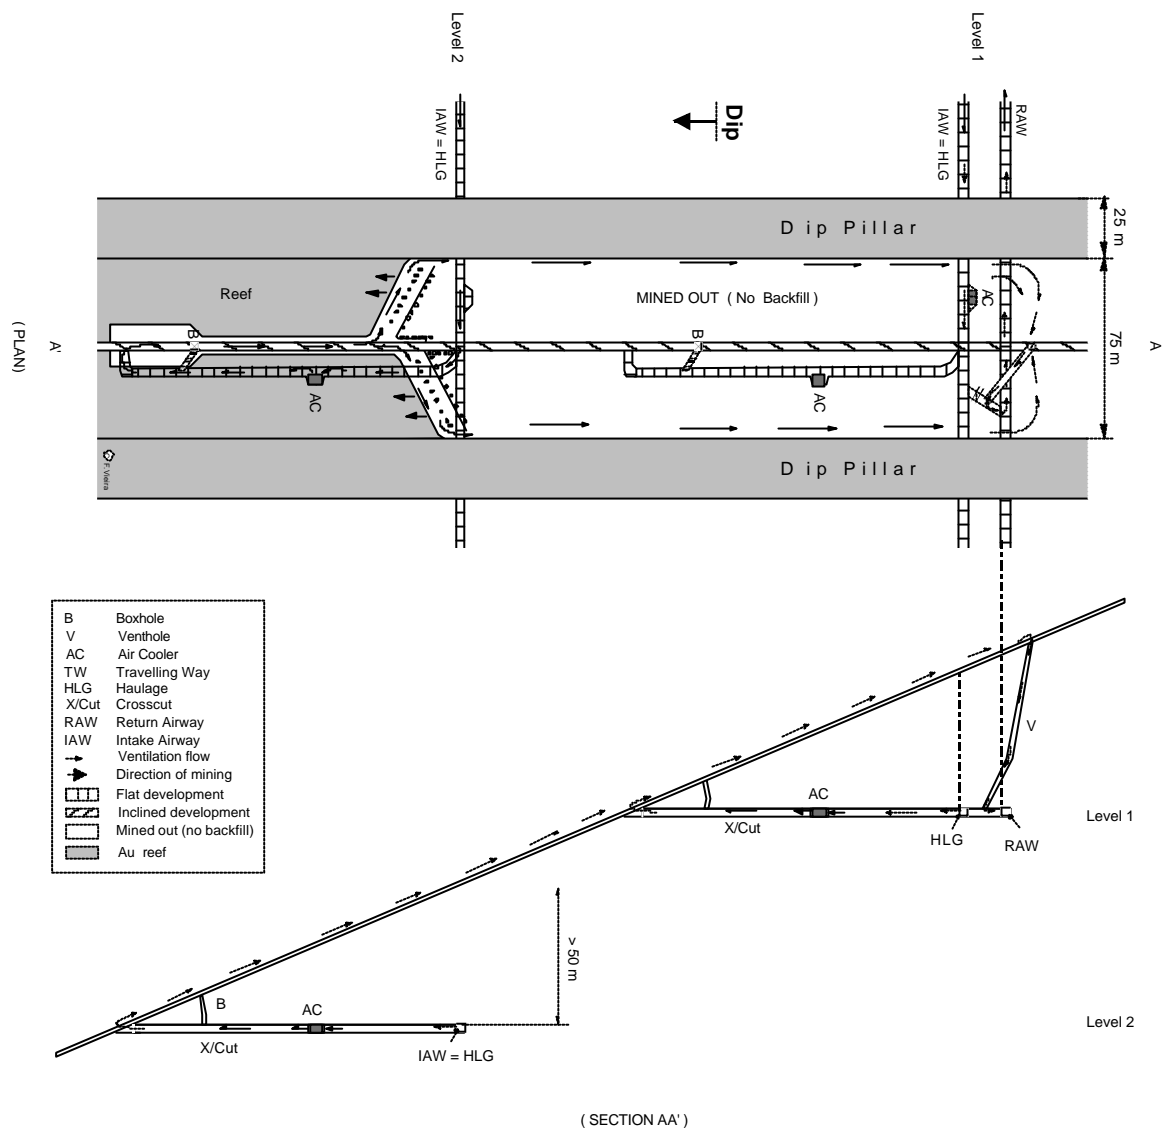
Micro concept of a sequential down-dip mining layout with dip orientated pillars.
